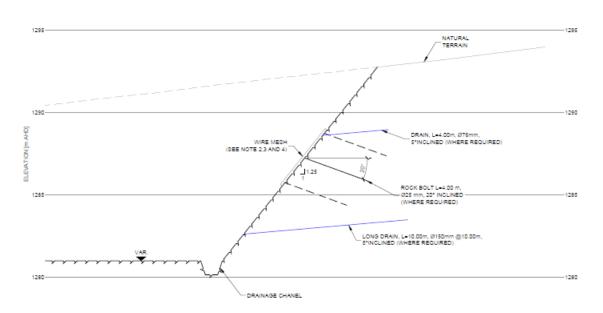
Typical section of Slope support – 1.25:1(V:H) GSI > 70
